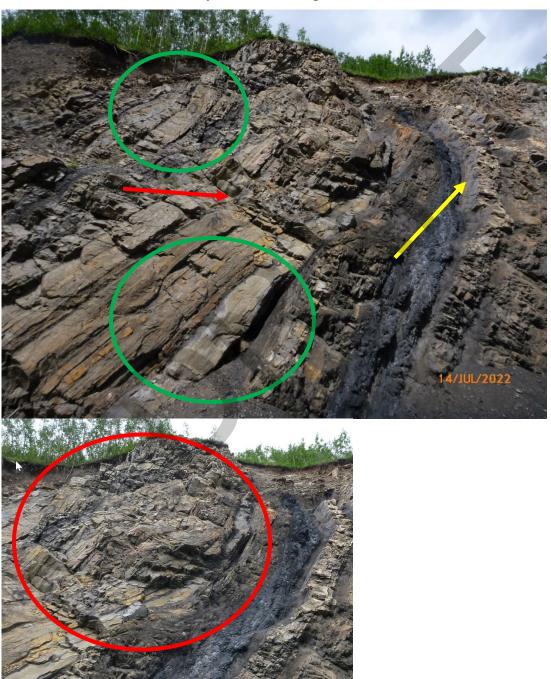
11 Additional coal seams and soft rock layers that have weathered and eroded, leaving blocks of rock unsupported. Photo taken July 14, 2022, facing northwest.
